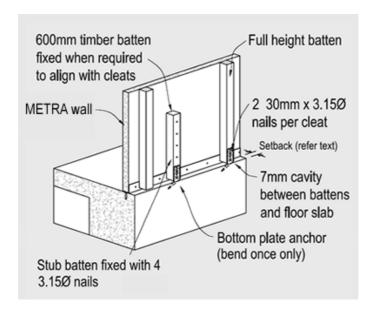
External Wall Tie Down Details Non Aligned Battens - Concrete Floor
